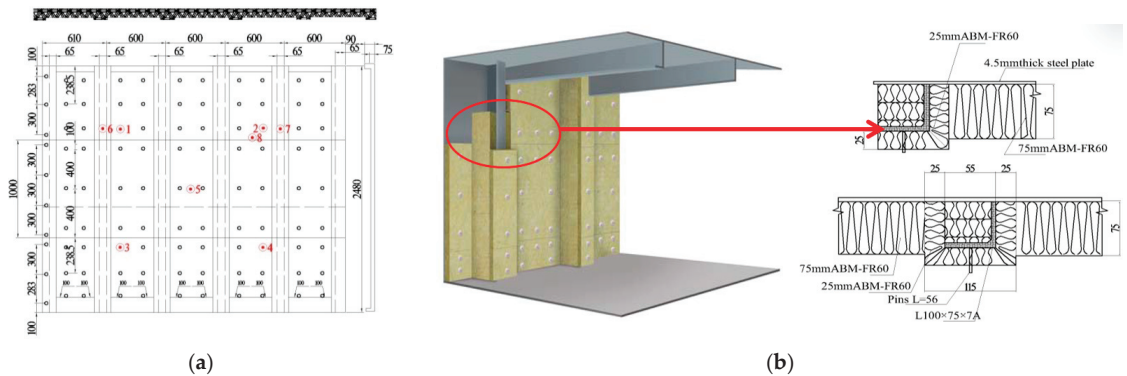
(a) Location of thermocouples on bulkhead A-60; (b) section of A-60 bulkhead specimen. (unit: mm).
